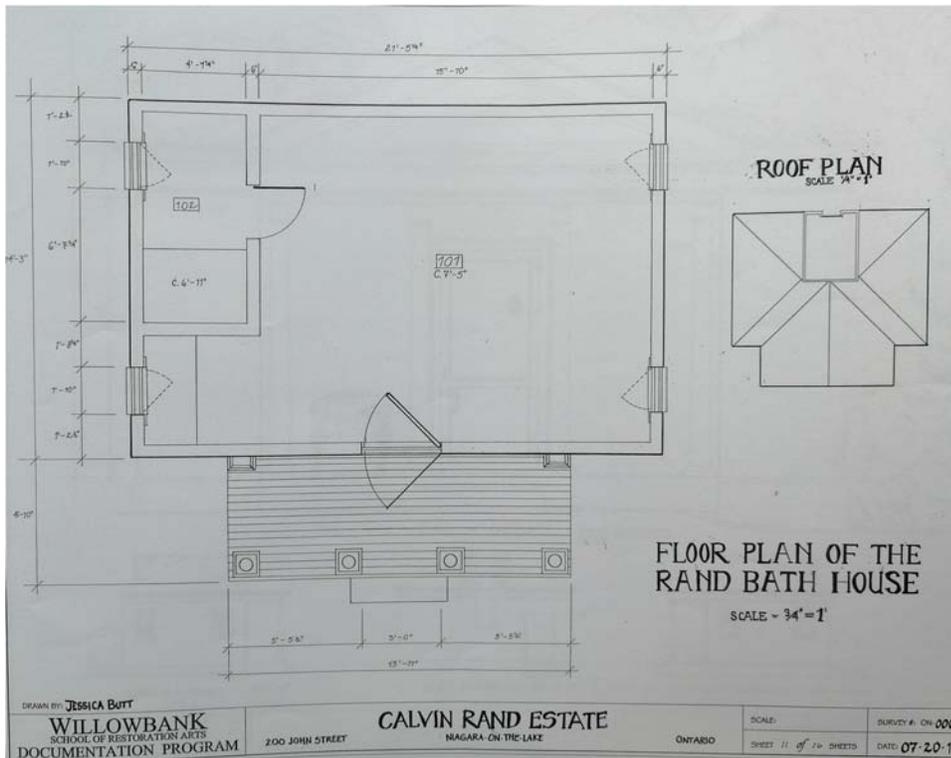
Drawing of floor plan for bath house (Willowbank, 2010).
